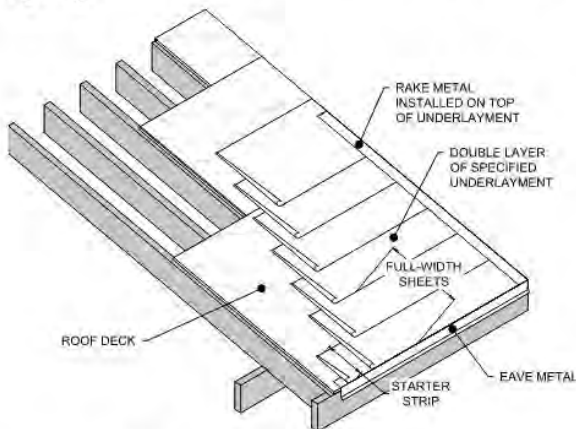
Application of Field Underlayment on Roof Slopes 2:12 Up to 4:12 (Non-Ice Dam Regions)
